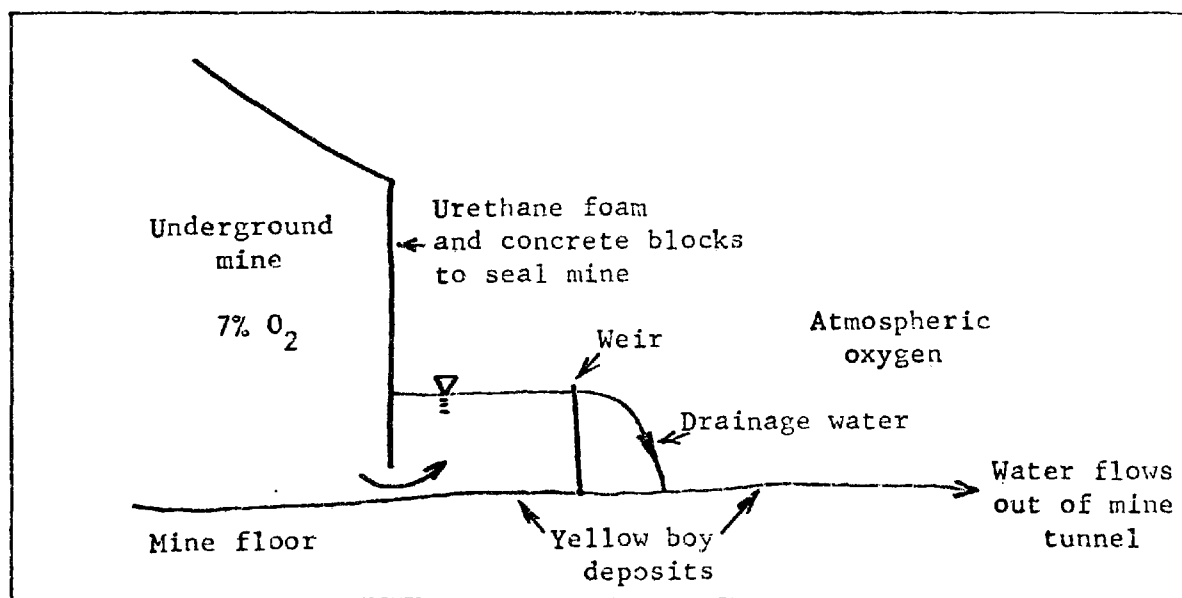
Profile of air-sealed entrance to underground mine near Elkins, West Virginia (Site RT 9-11).
